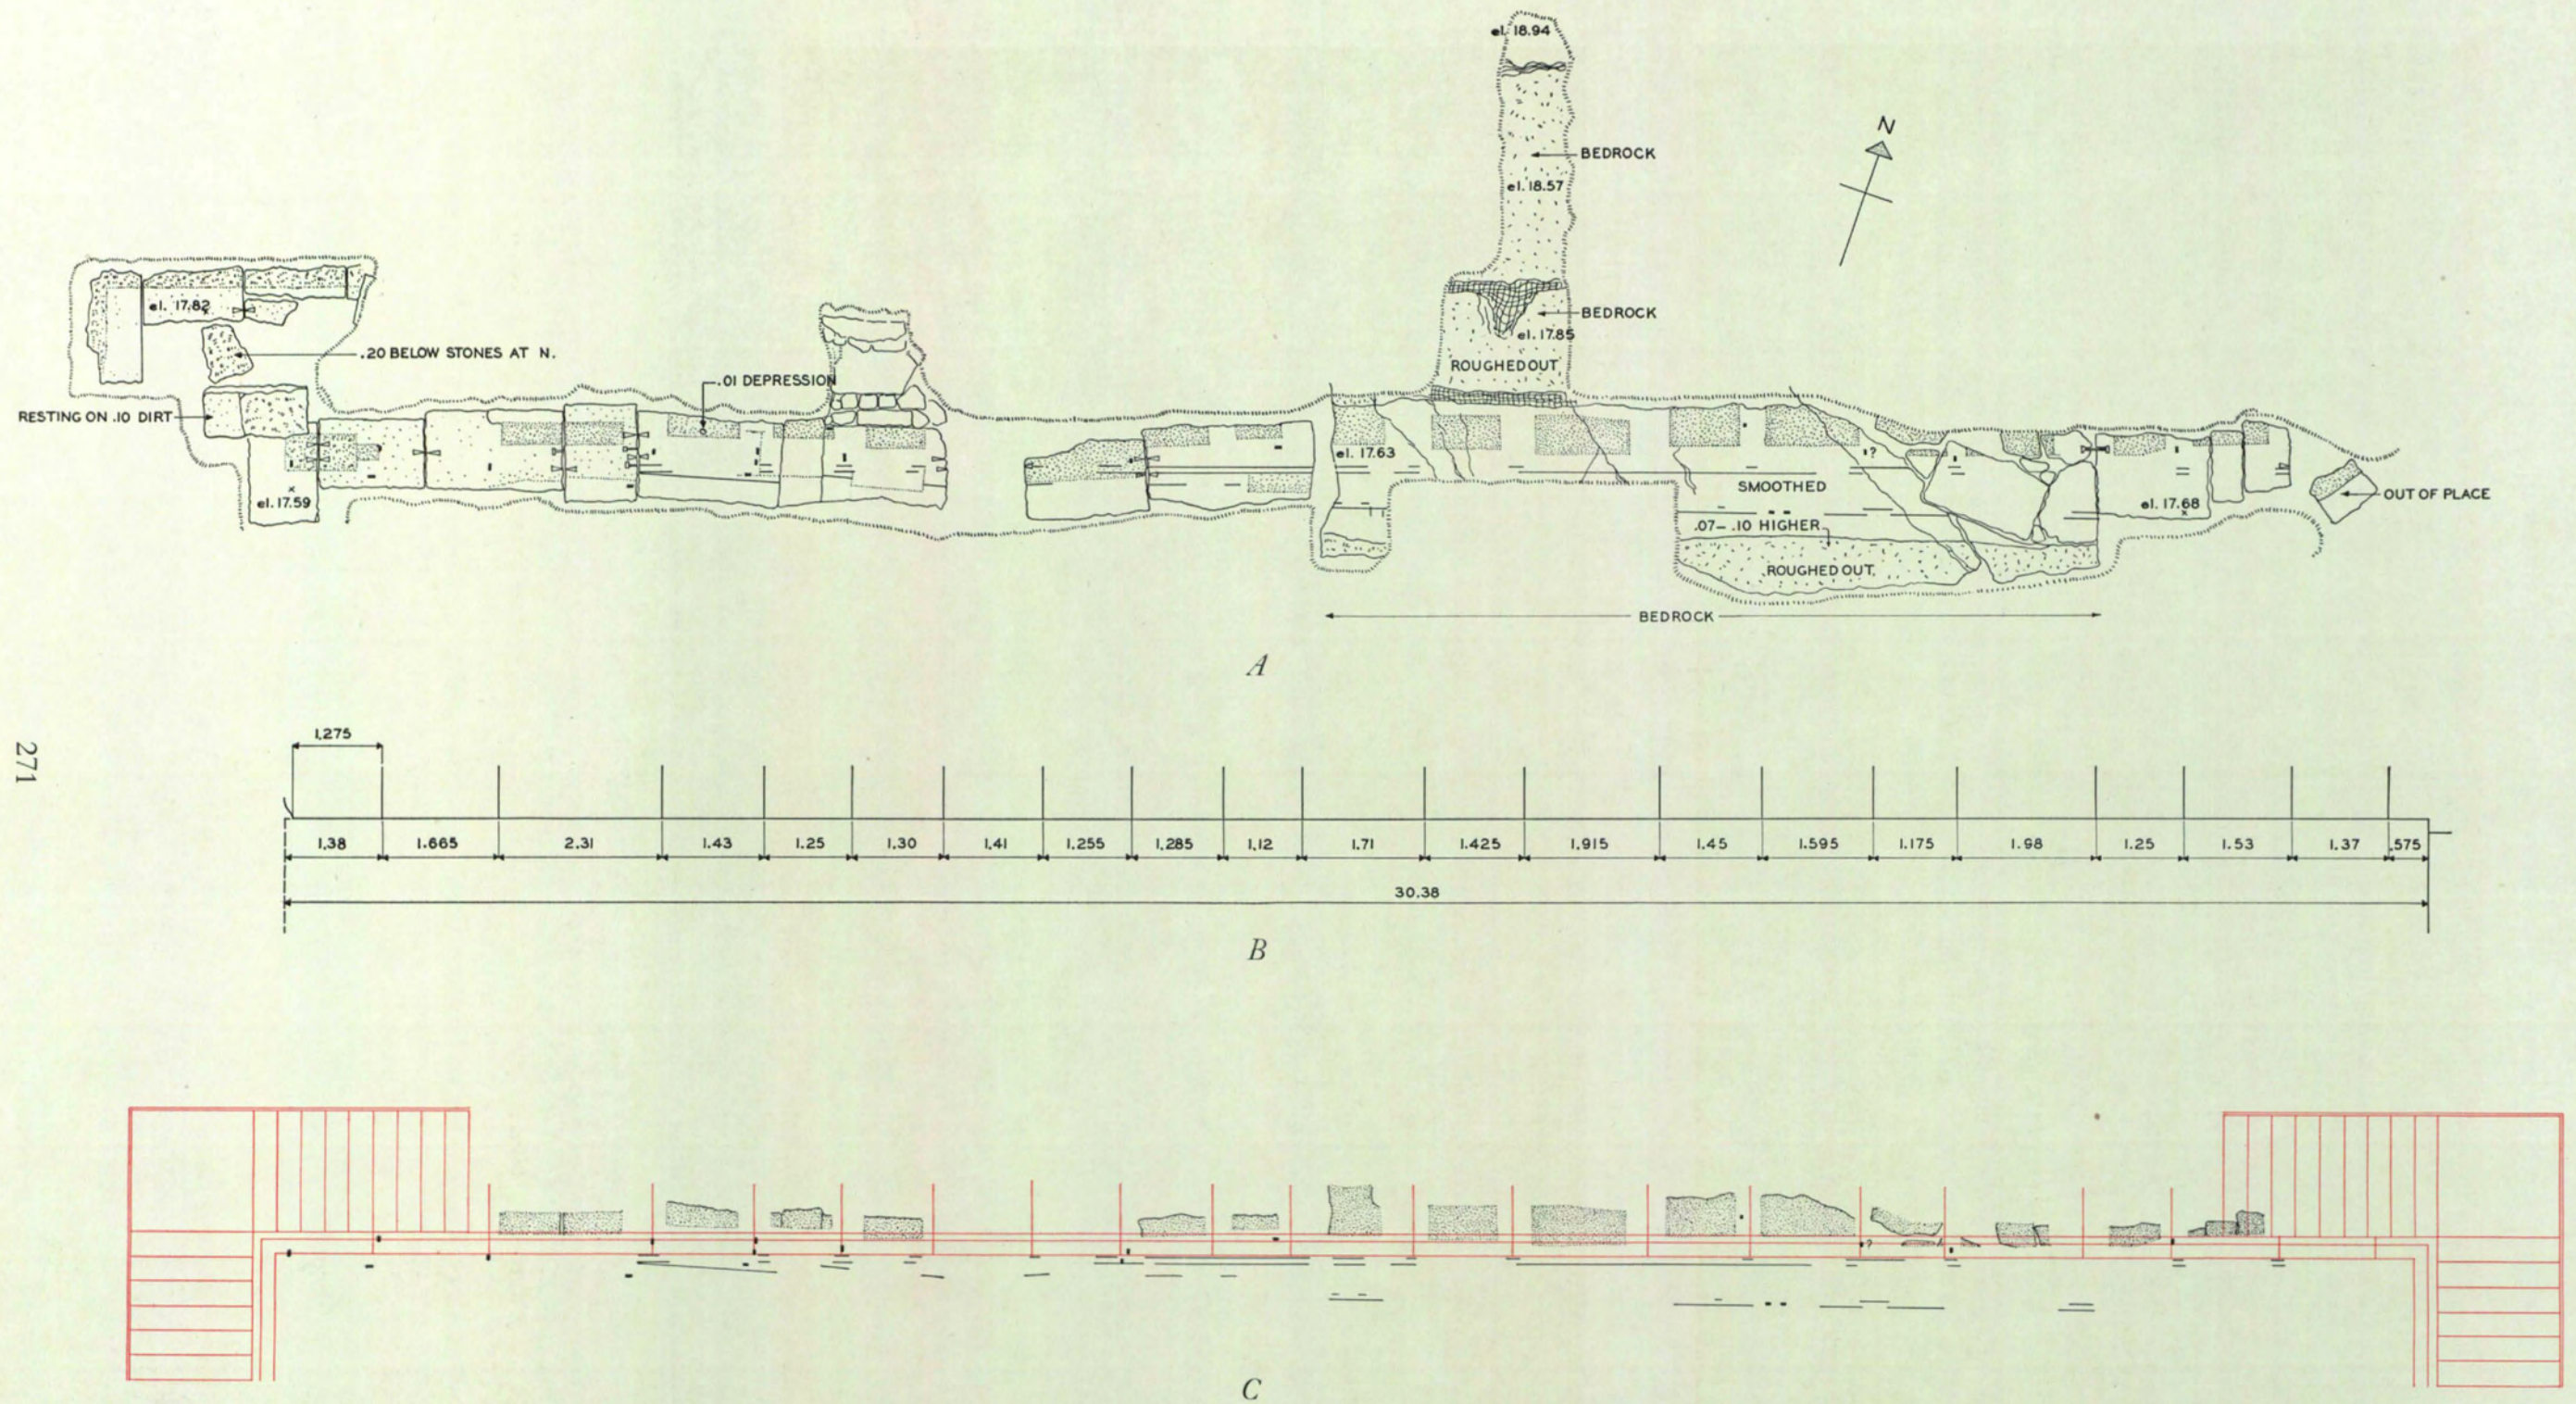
PALACE G. SCALE, 1:100. A. PLAN OF AREA TESTED ALONG SOUTH FRONT OF SITE. B. SPACING OF STONES OF FAÇADE OF ARTAXERXES III (FROM PALACE H).
